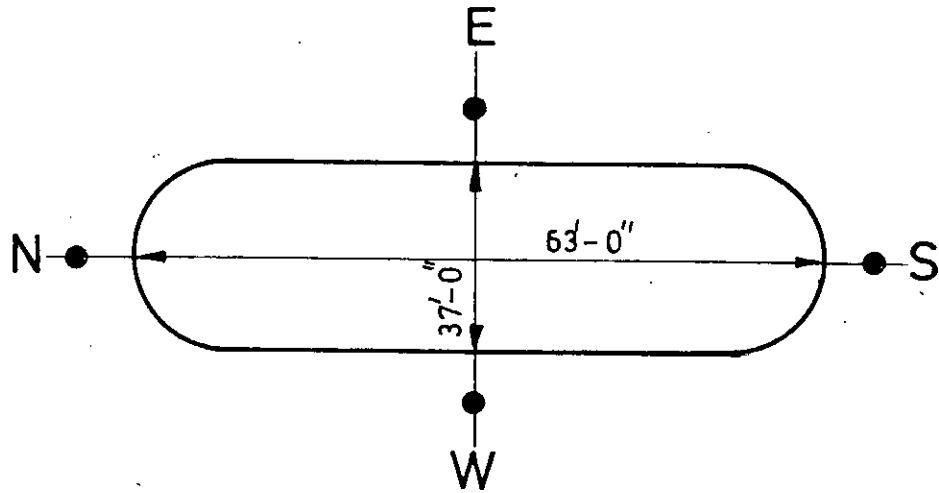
(a) SCOUR OBSERVATION POINTS AROUND A PIER OF HARDINGE BRIDGE
